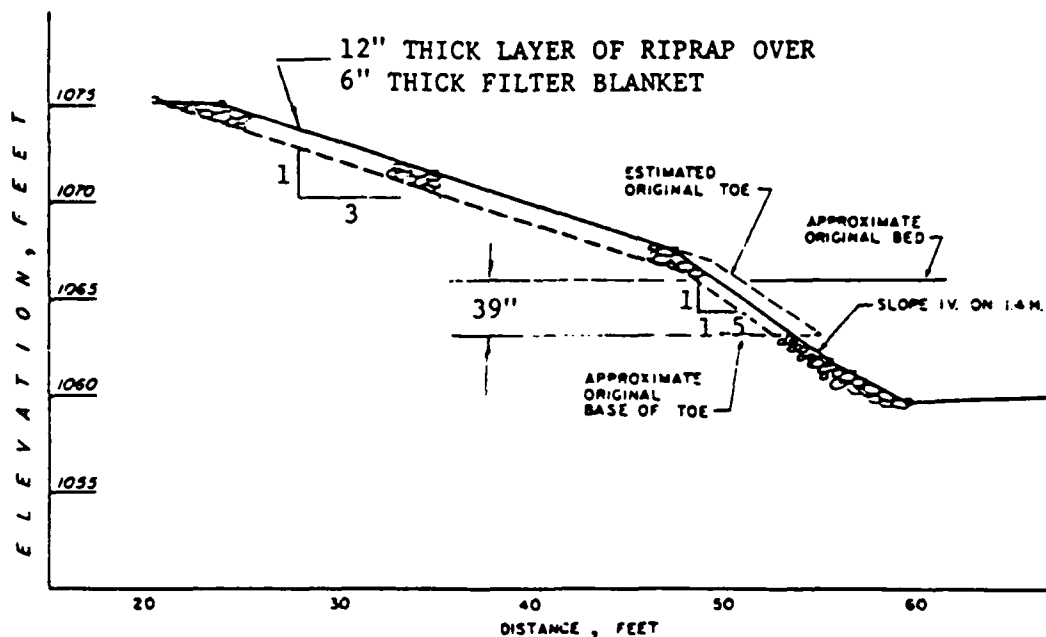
Republican River at Milford Dam Outlet Channel, Kans. Cross-sectional view of Test Section 1 shown as constructed in 1969 and as surveyed in 1974.
